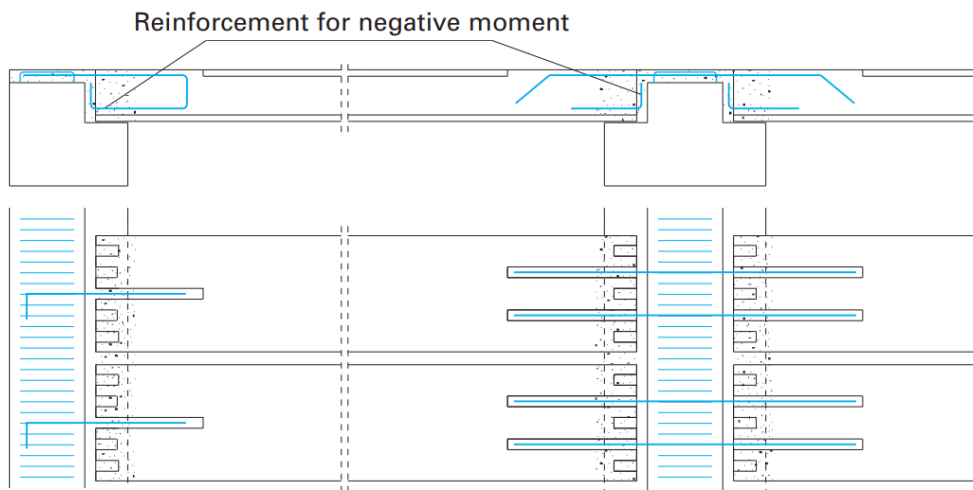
Typical connection between wall and floor for buildings higher than 10 storeys
